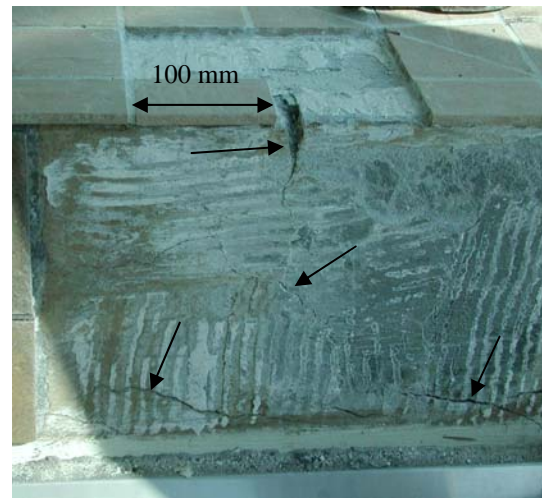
Cracking of the concrete behind the tiles on the vertical surface near the top of the wall, above the water gutter (see Figure 11).
